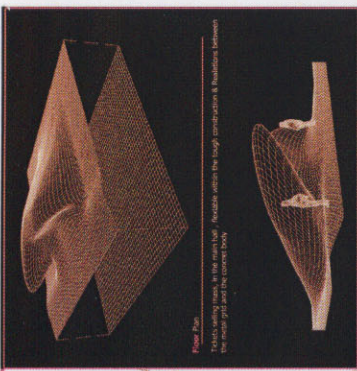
The perforated facade structure, formed with the rough construction & finished between the structure and the inner wall.
